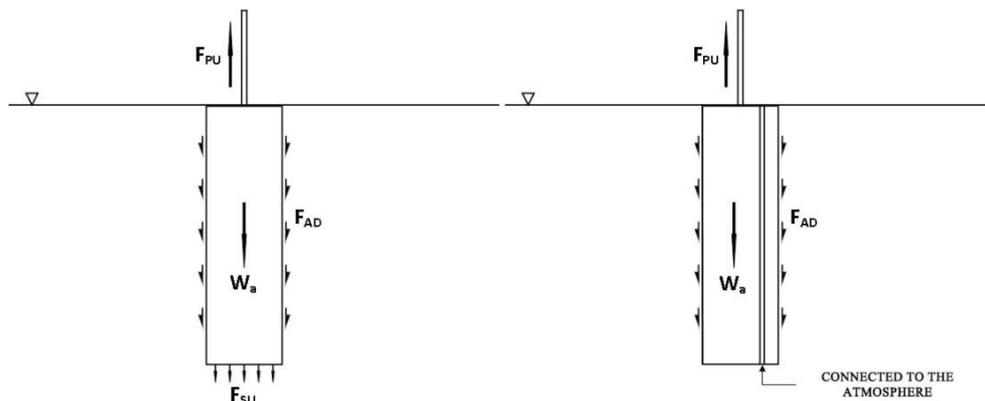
Forces on the model pile foundation when bottom sealed and vented
